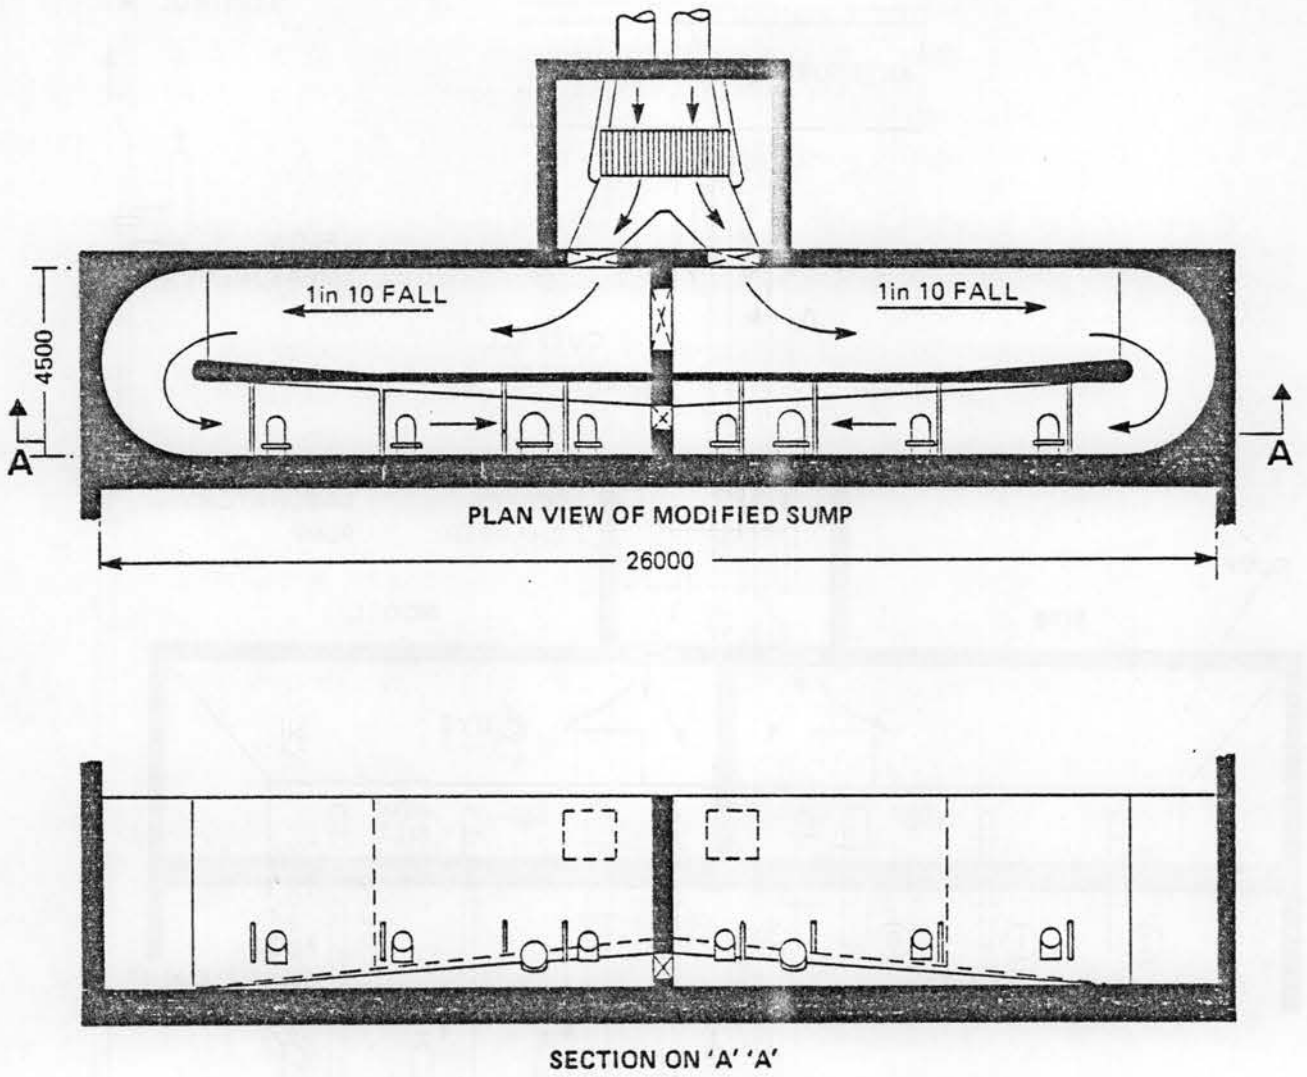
FINAL LAYOUT OF SEWAGE SUMP
